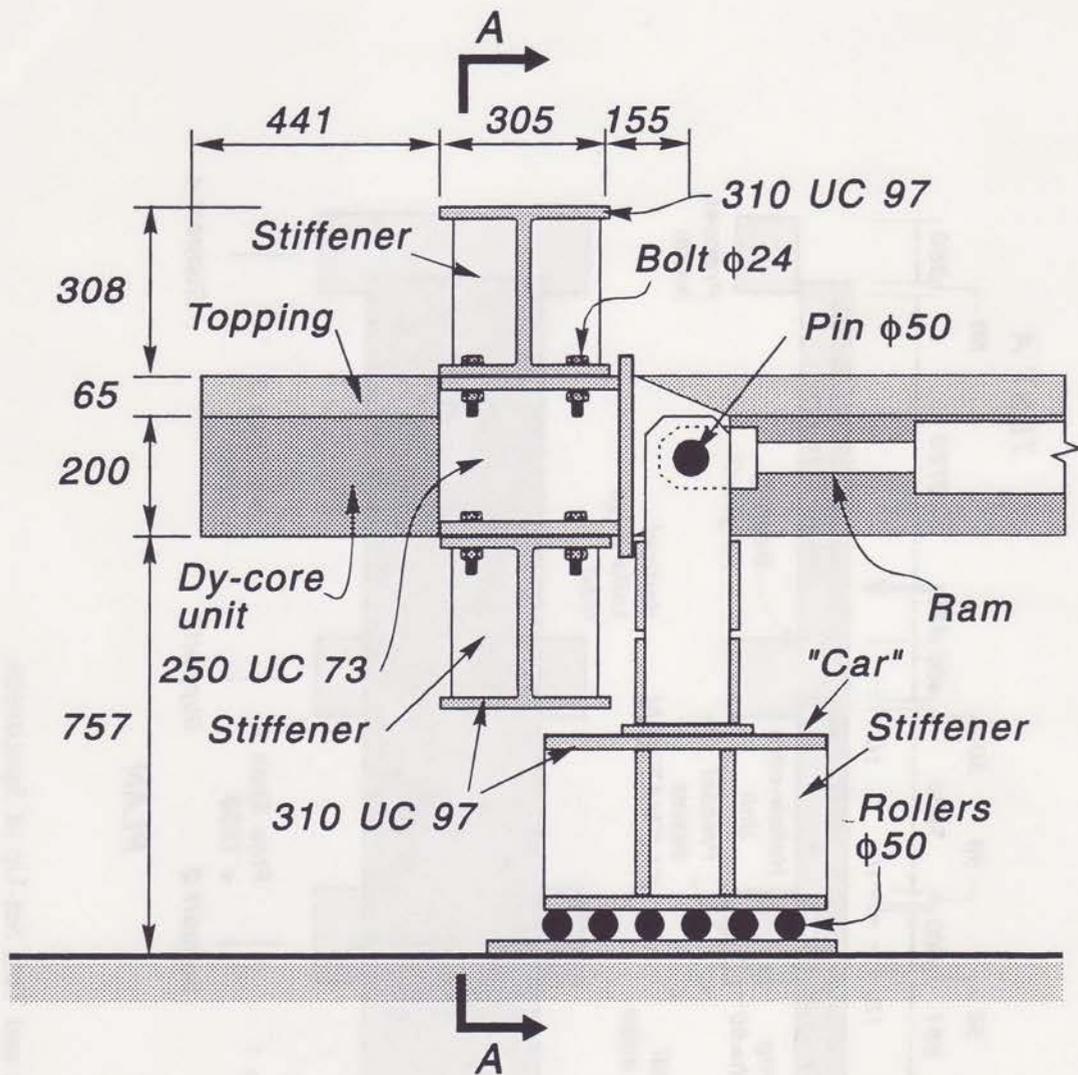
Hinge Mechanism at Support 1. - Elevation
